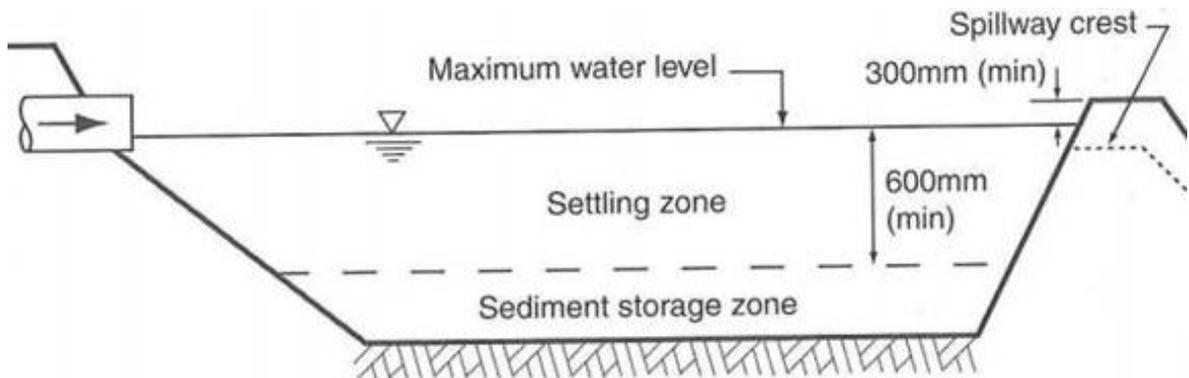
Typical sediment dam cross-section (Source: IECA, 2008)
